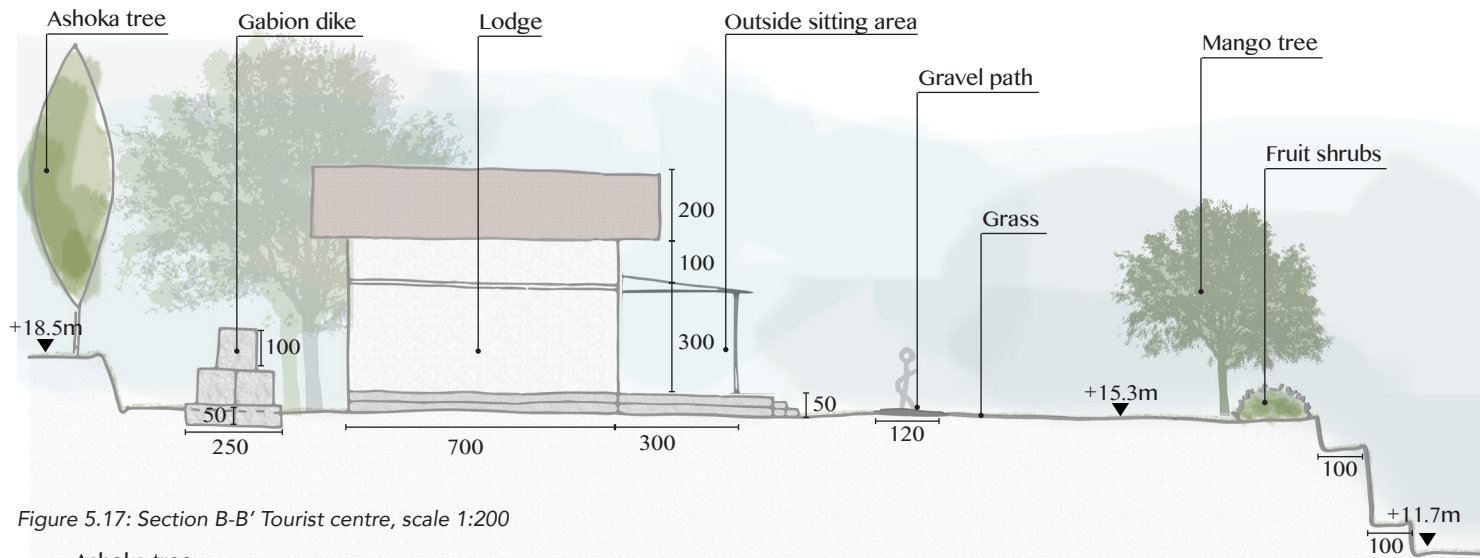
Section B-B' Tourist centre, scale 1:200
